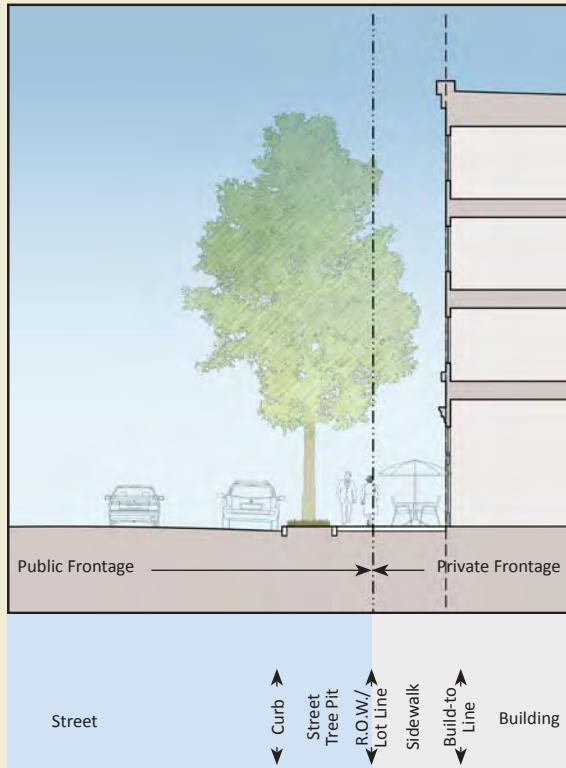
Front Yard Type I. – Tree Pit and Hardscape
